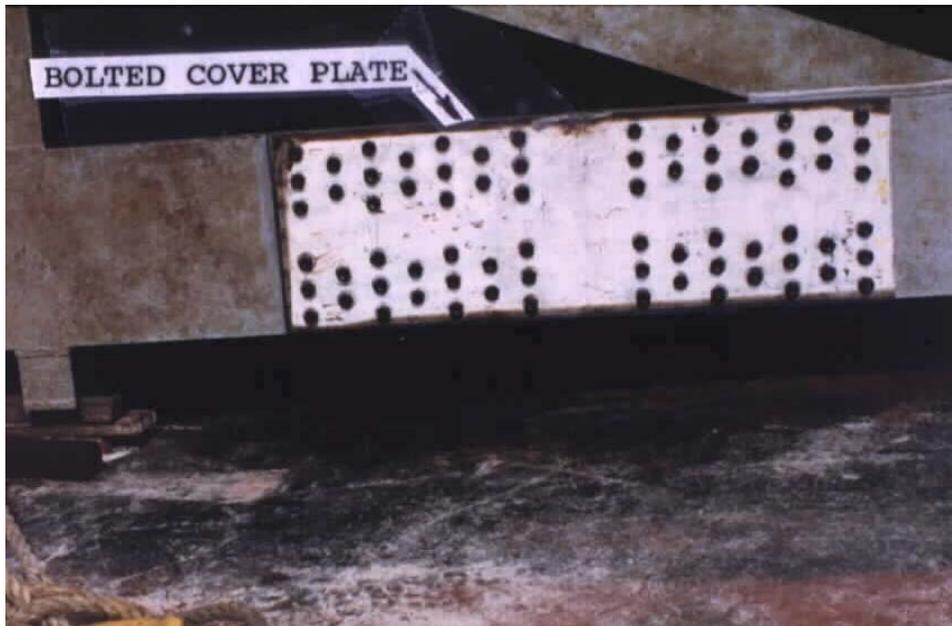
Bolted repair splice for the girder shown in Figure 8-13
